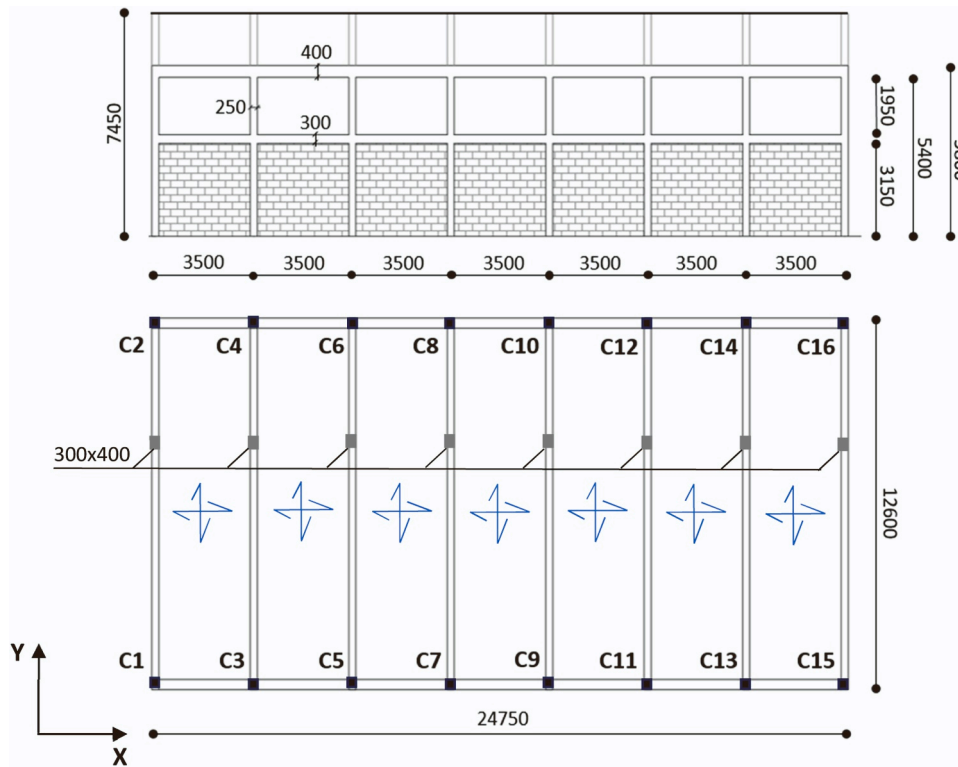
Side façade and structural plan of case study building (dimensions in millimeters).
